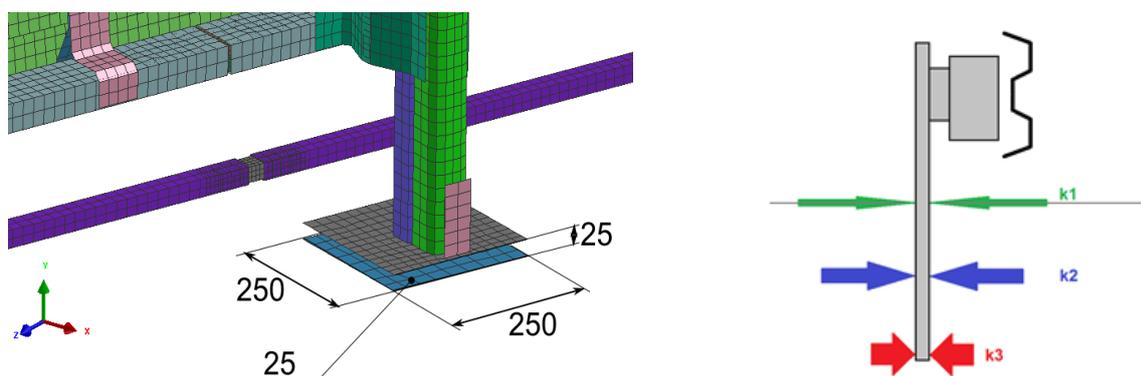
Detail of two different type of road barrier anchorage (bridge parapet – post rammed in soil)
